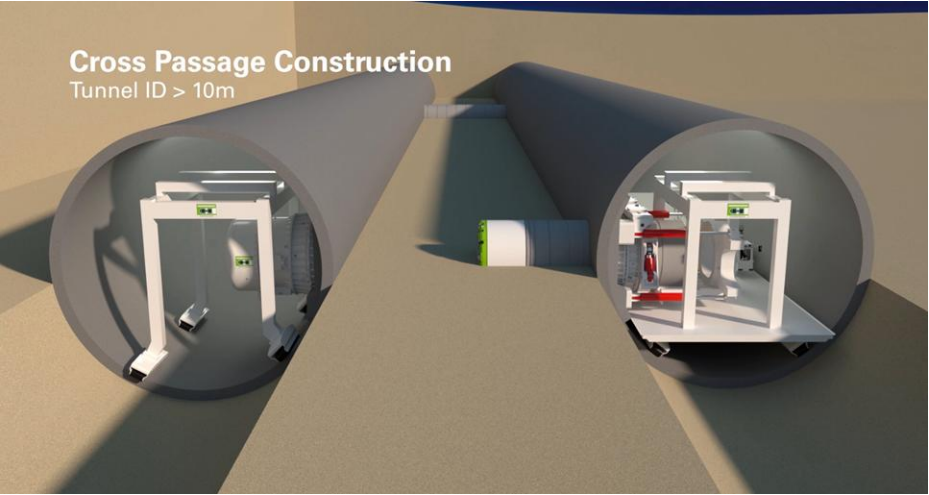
Exemplary equipment setup for AVN3000 MTBM cross passage construction
